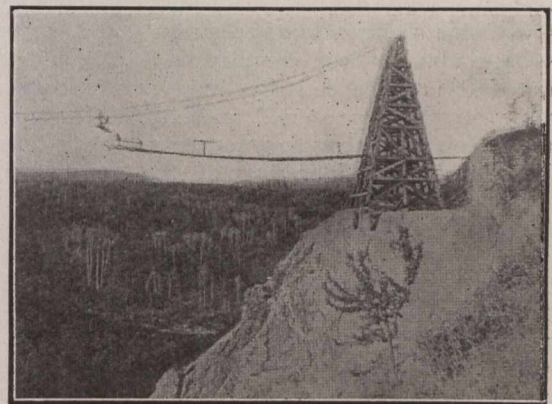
Bulkley River Bridge in Early Stage of Construction.
